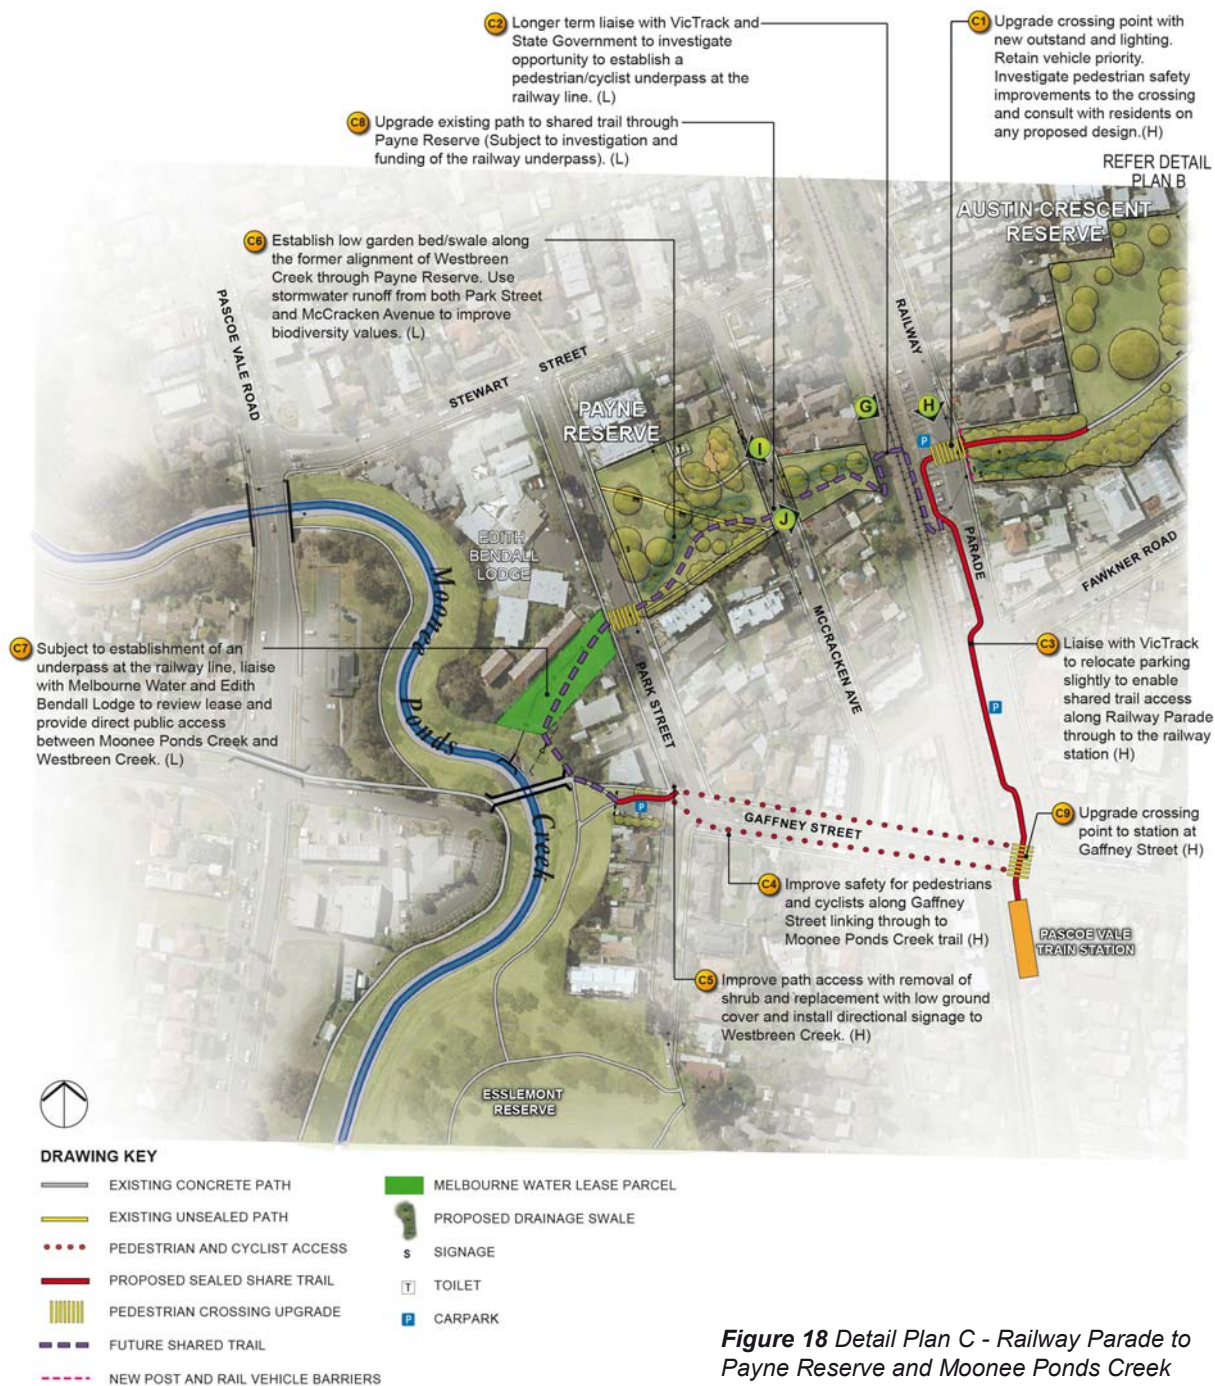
Detail Plan C - Railway Parade to Payne Reserve and Moonee Ponds Creek
